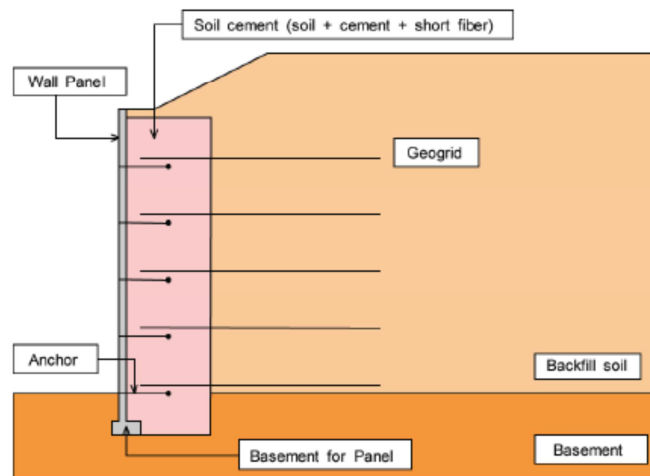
Soil cement mixture behind MSE wall facing panels from Ito et al. (2006)
